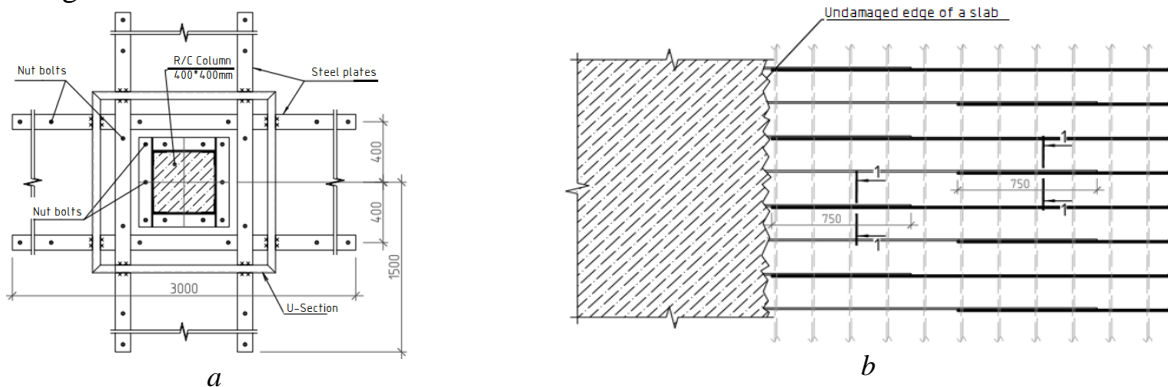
Schemes of strengthening recommended of horizontal structural elements: a – punching shear zones; b – floor and roof slabs
